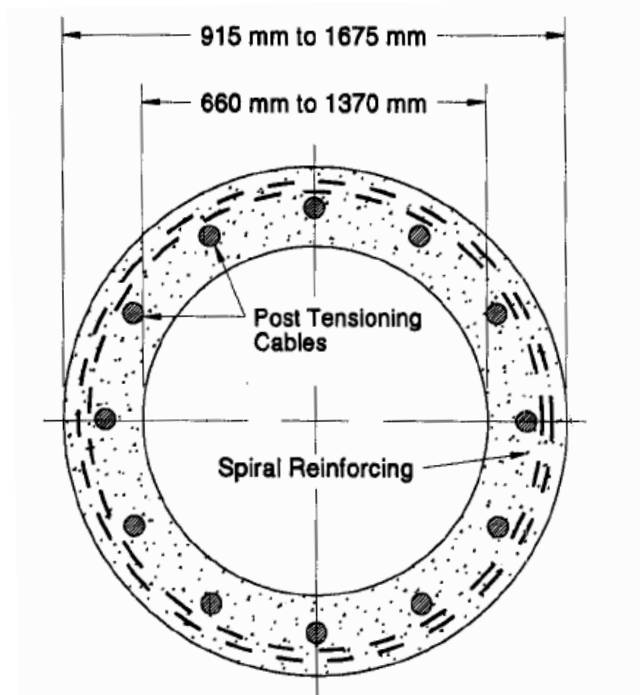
Concrete cylinder pile (Design and Construction of Driven Pile Foundations, U.S. Department of Transportation, 1998)
